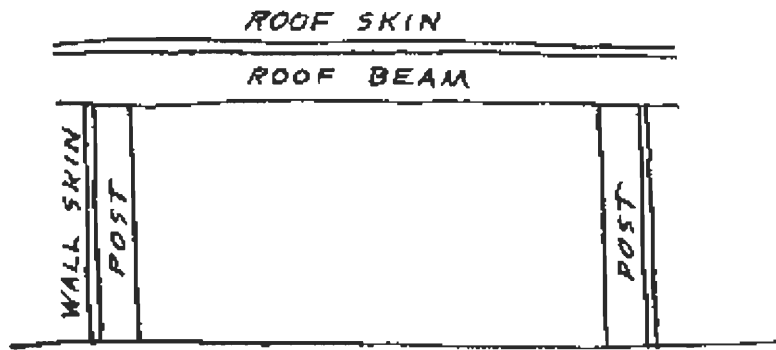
Flat roofs require extra thick support beams (Roberts, 53)
